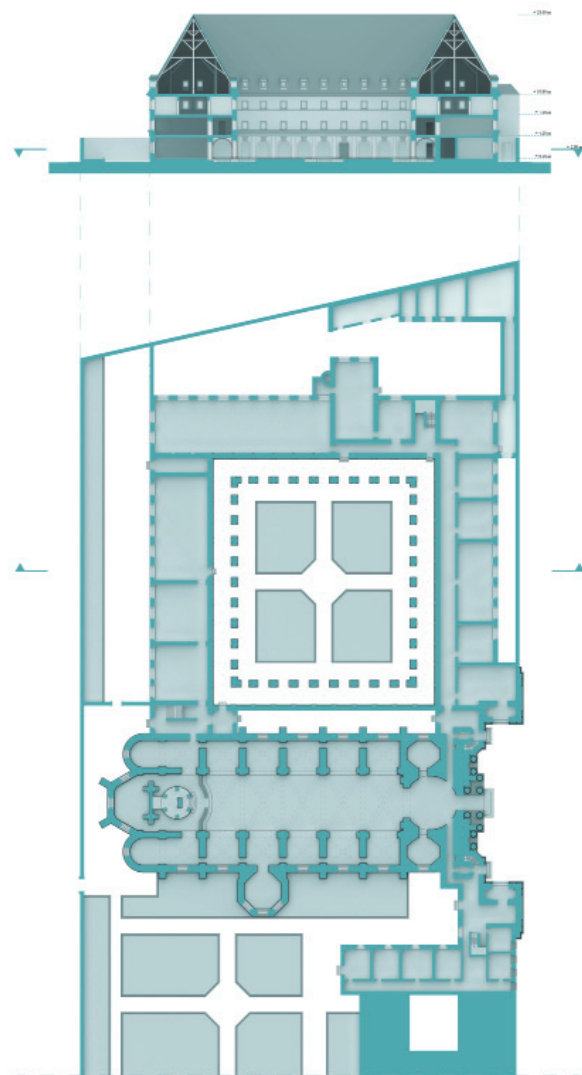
L. D'Elia, 3D model of the Convent, longitudinal section of the Convent and ground floor's plan.
